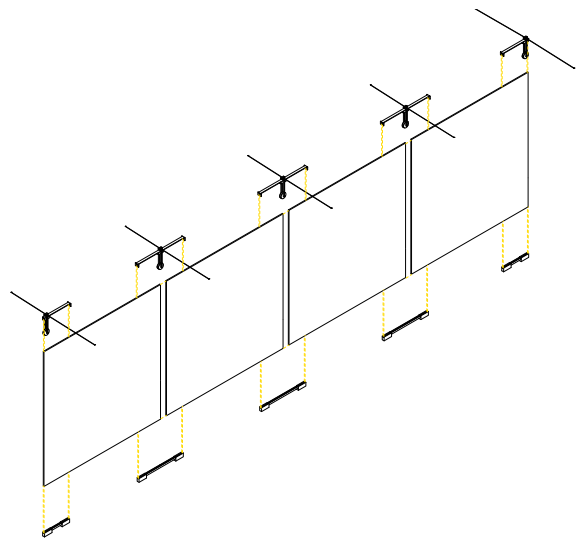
Construction detail - Exhibition wall of the exhibit | Axonometric exploded view.
